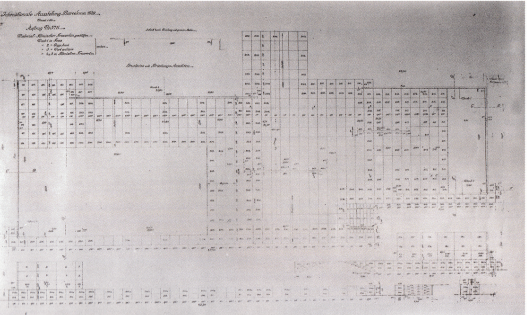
Plan and elevations of the pavings and claddings supplied by *Köstner und Gottshalk*, 1929.
